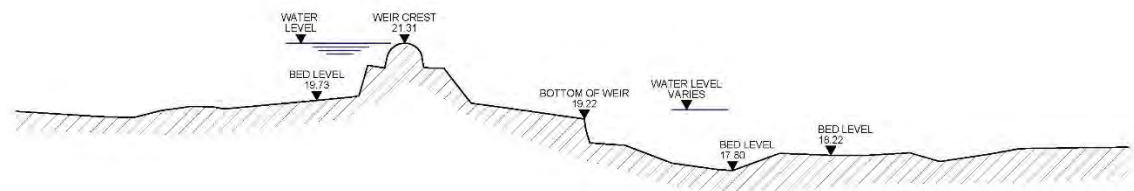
Typical Section through Gravity Wall Weir at Fermoy
